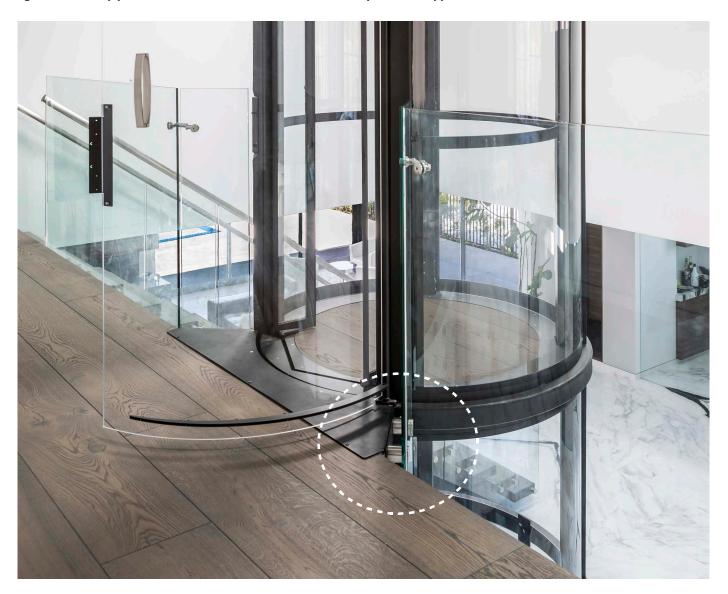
Balcony plate and handrail information - round acrylic (RAM) type 1 shown
